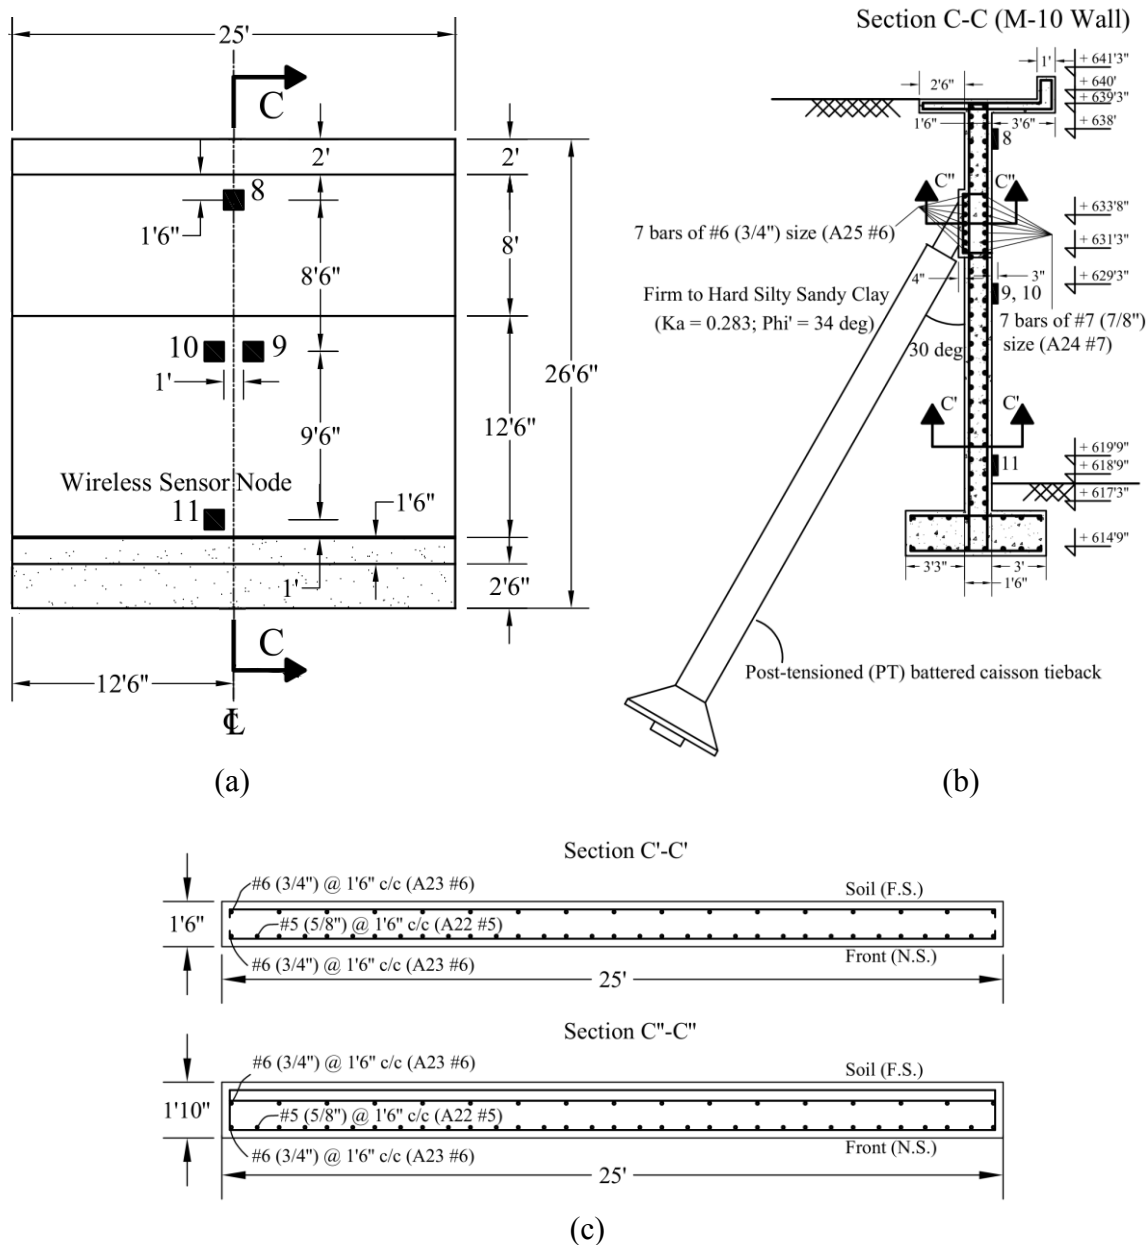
Structural details of the M-10 wall: (a) front elevation; (b) sectional profile; (c) cross-sectional profile detailing reinforcement.
